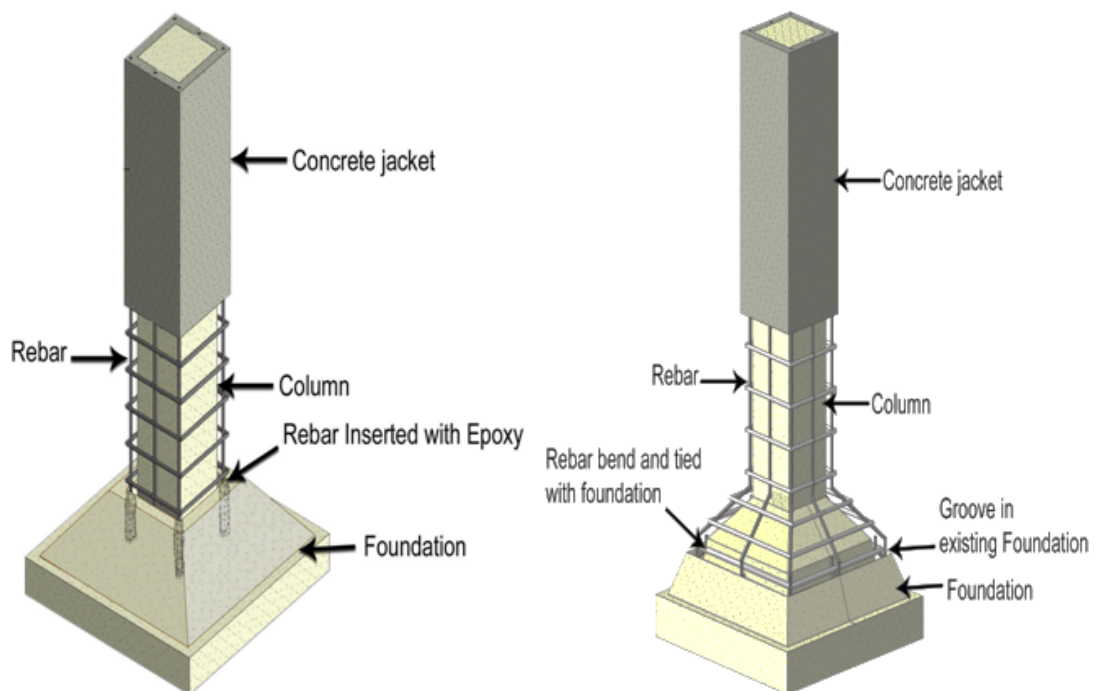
Jacketing of column and foundation (credit: TESRA ppt)
